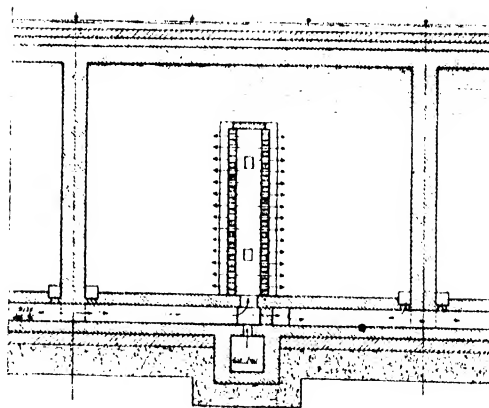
Longitudinal Section W.D. Chamber Kiln
